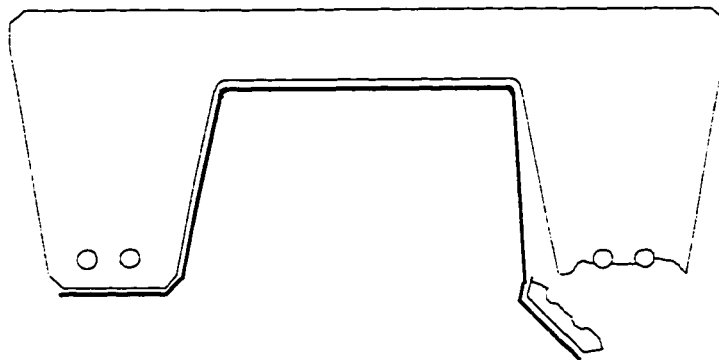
Effect of Spalling Concrete on CFRP Sheets
